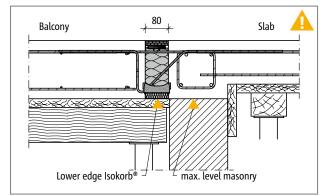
Schöck Isokorb[®] T type K: In situ concrete with height offset floor on masonry wall
